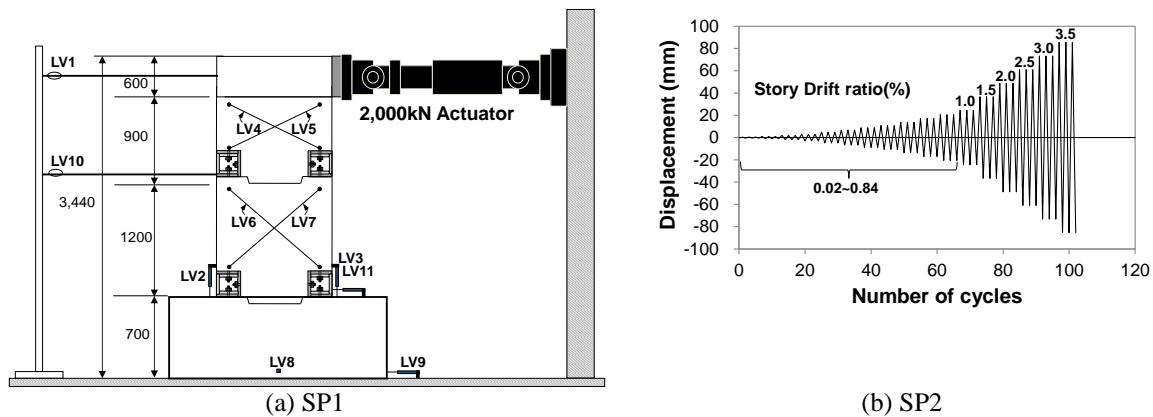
Test setup and loading history (Notes: Dimensions in mm, 1 mm = 0.0394 in., 1 kN = 0.225 kips; LVDT is linear variable differential transformer)
